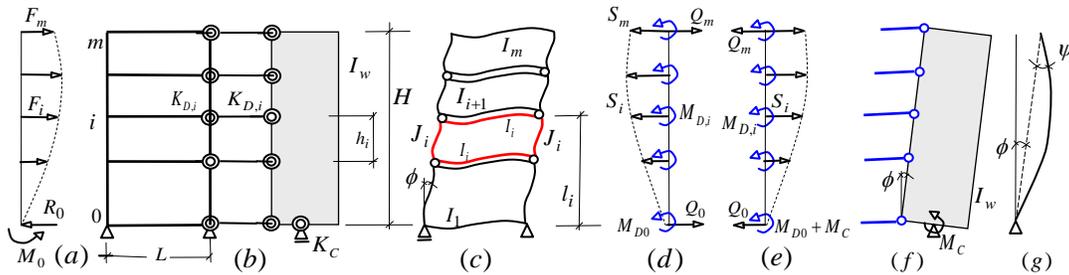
(a) Loading, (b) Proposed dual system, (c) Modularized free body diagram, (d) Forces acting on the frame, (e) Forces acting on the wall, (f) Rocking wall and added devices, (g) Displacement profile of the wall.
